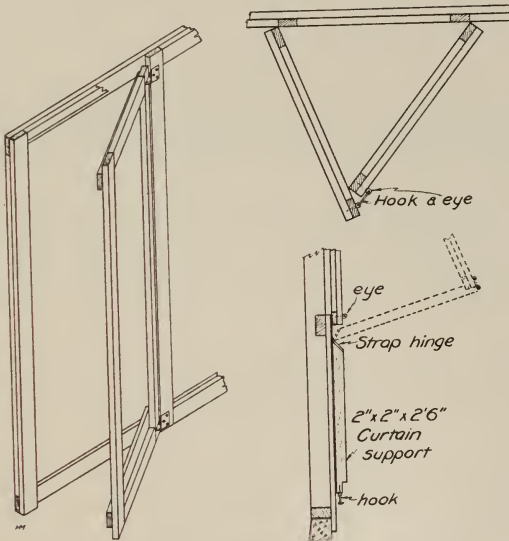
Detail showing construction of three-purpose curtain. For further details see figures 25 and 53.
